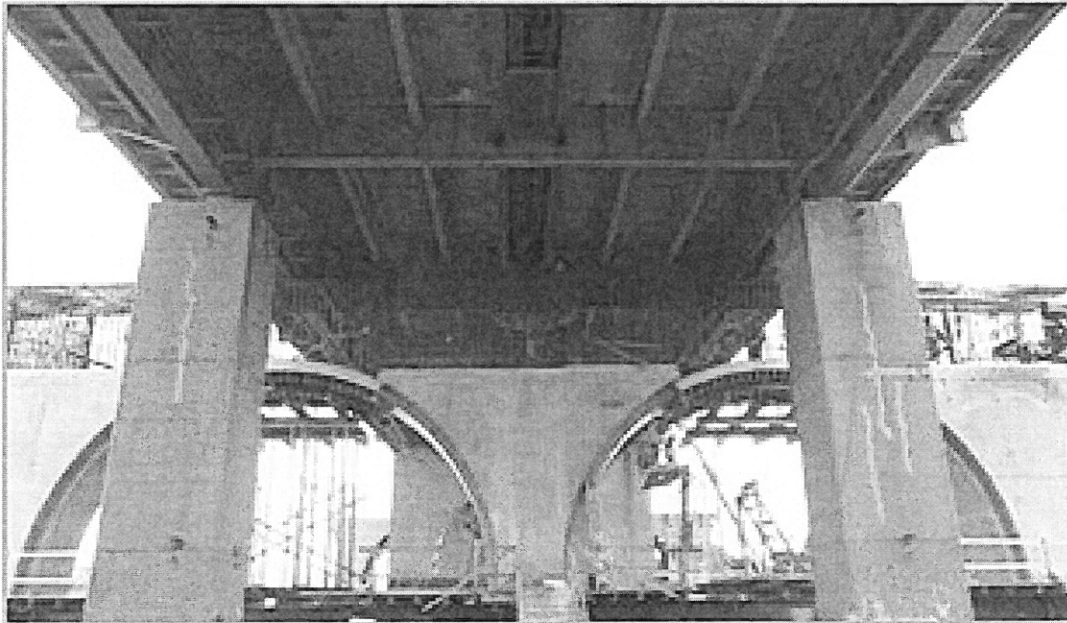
Construction occurring on the Bronx side of the Bronx-Whitestone Bridge. The existing two column piers are being replaced by three-column arched piers, the same as proposed on the Queens side (www.mta.info/bandt/html/btconstruction.html)
